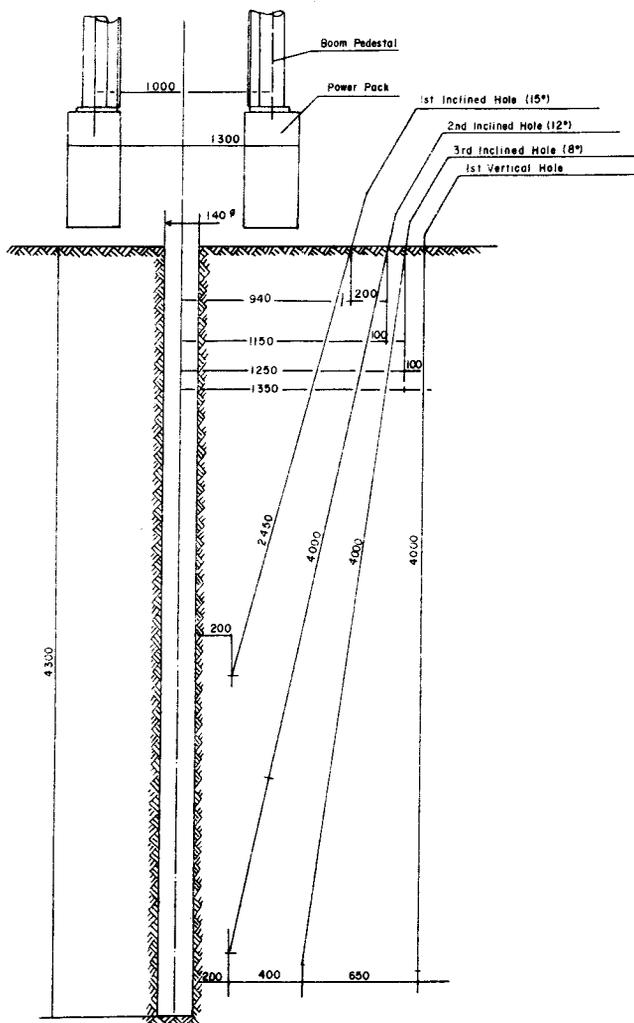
The drilling pattern of 9- and 8-boom 'central column' drilling rigs
